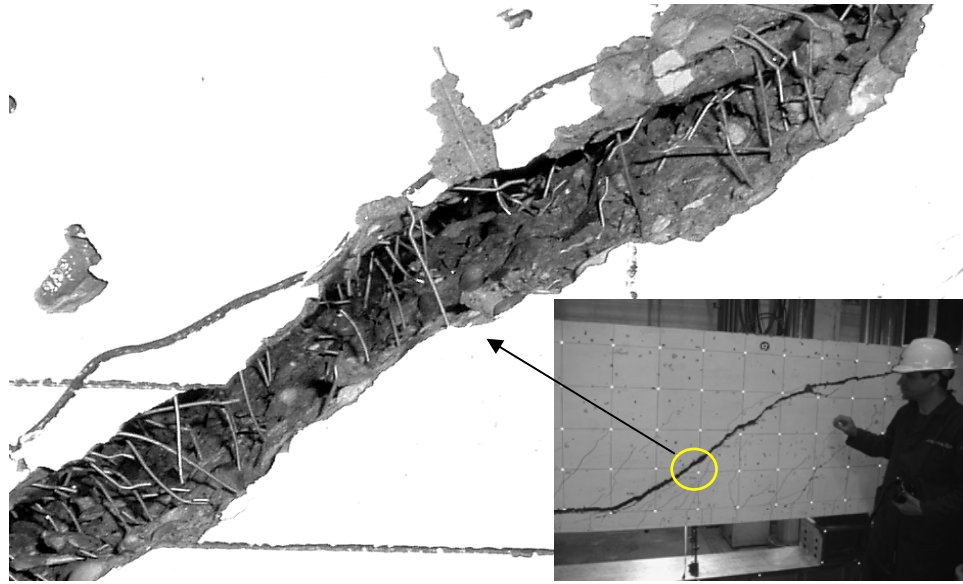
Critical shear crack after failure for a typical normal weight SFRC specimen.
